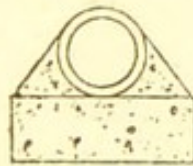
DRAIN LAID ON AND PACKED WITH CONCRETE.
